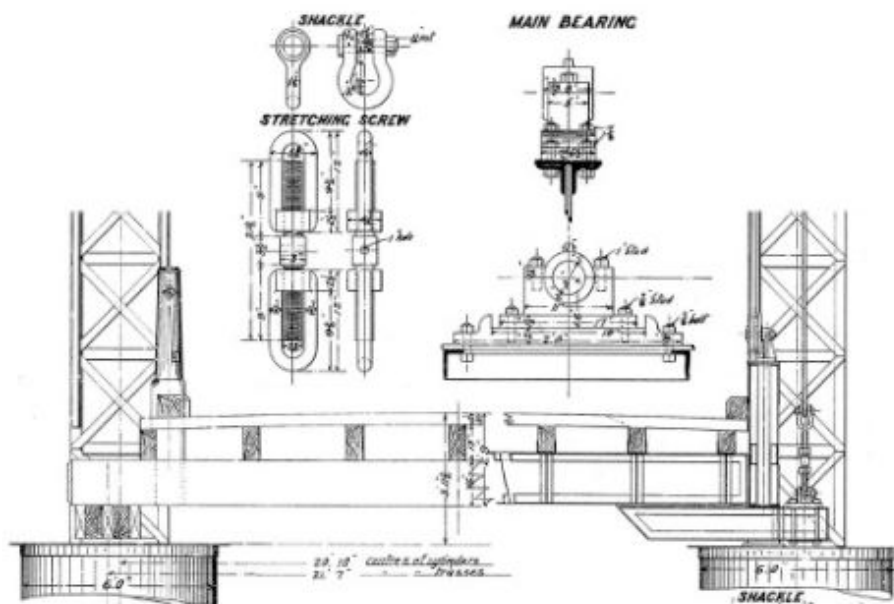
Original cross section and stretching screw for the Hinton lift span
